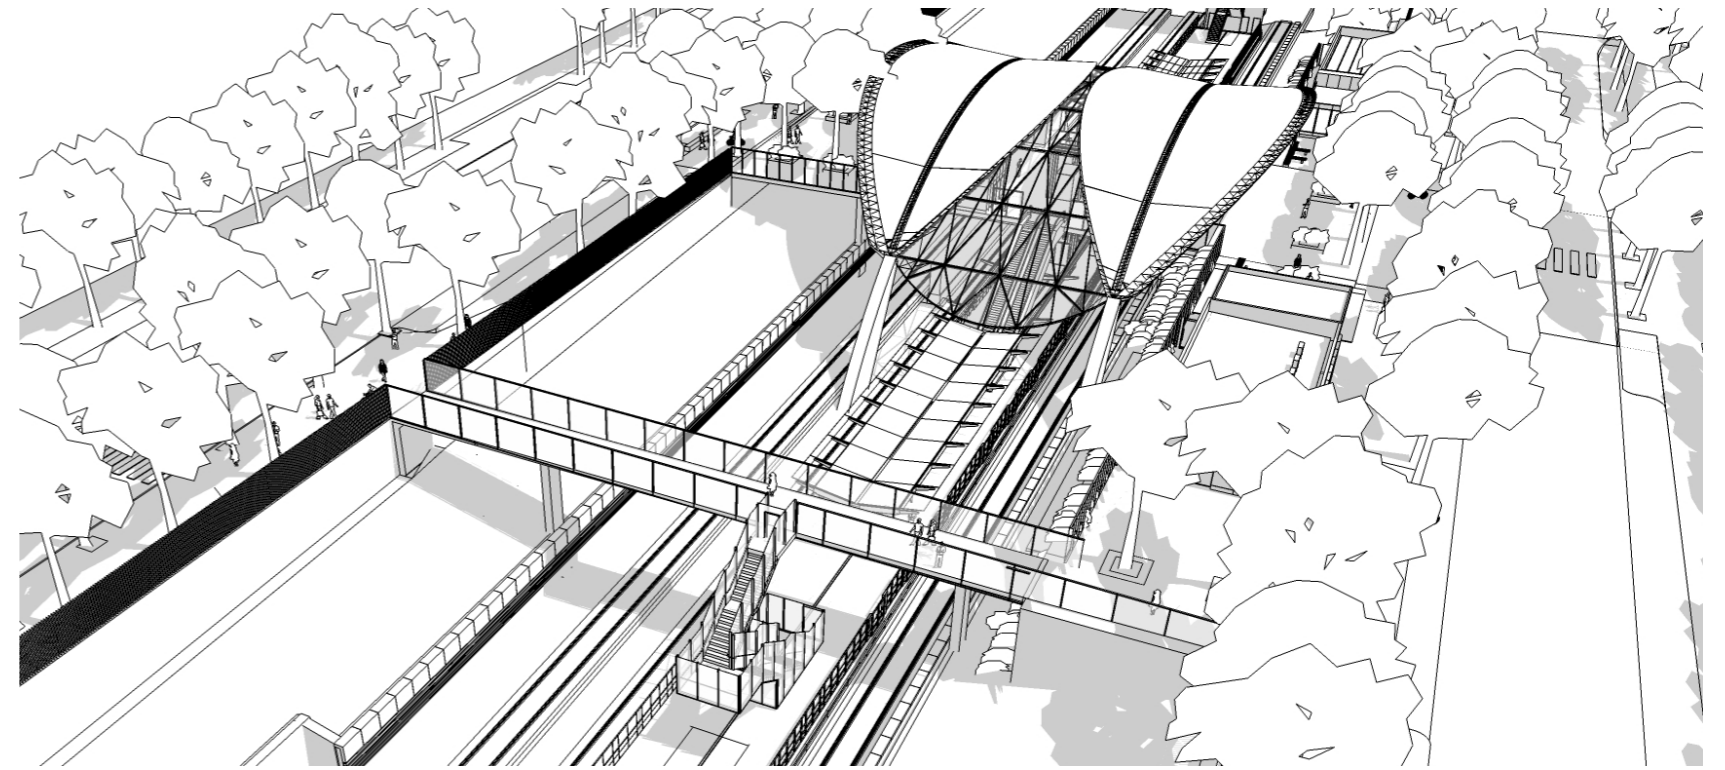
Impression of Pedestrian Bridge at Cudgegong Road Station. Source: HASSELL
